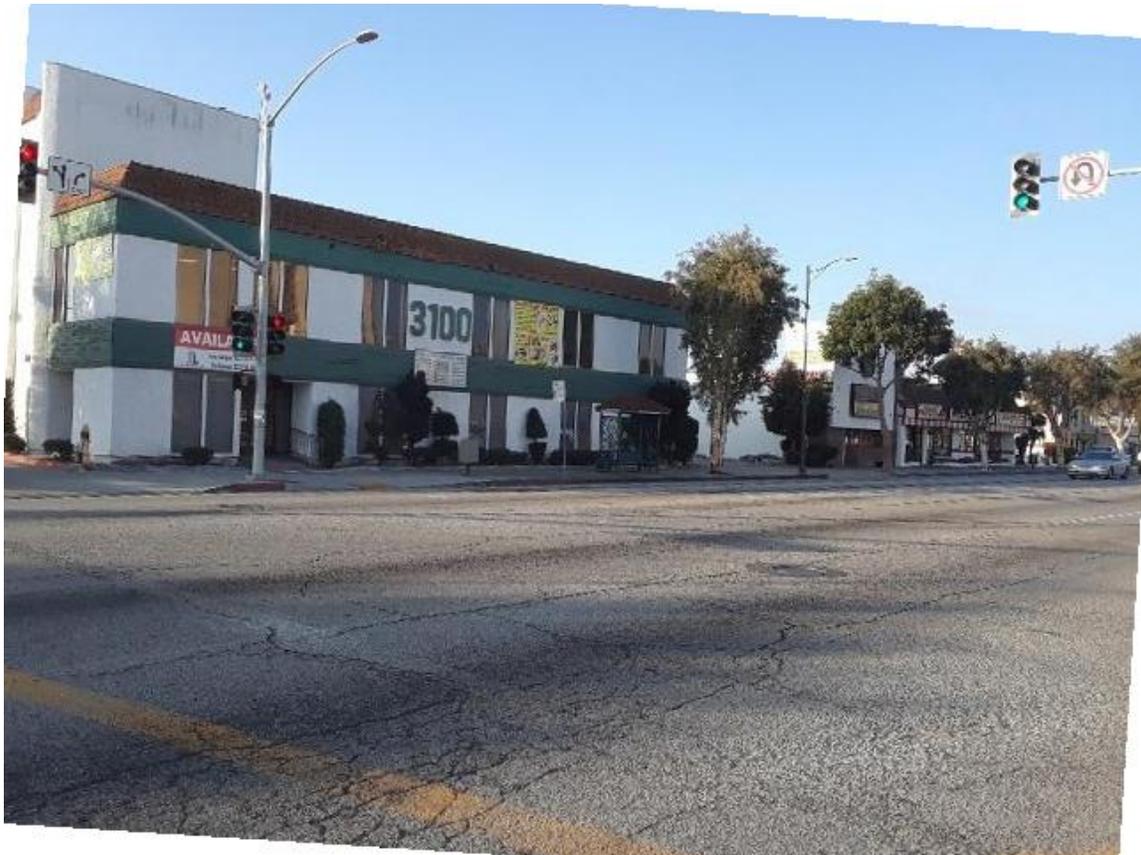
View from the NEC of Florence Ave./Mission Pl. facing the existing site office building.
